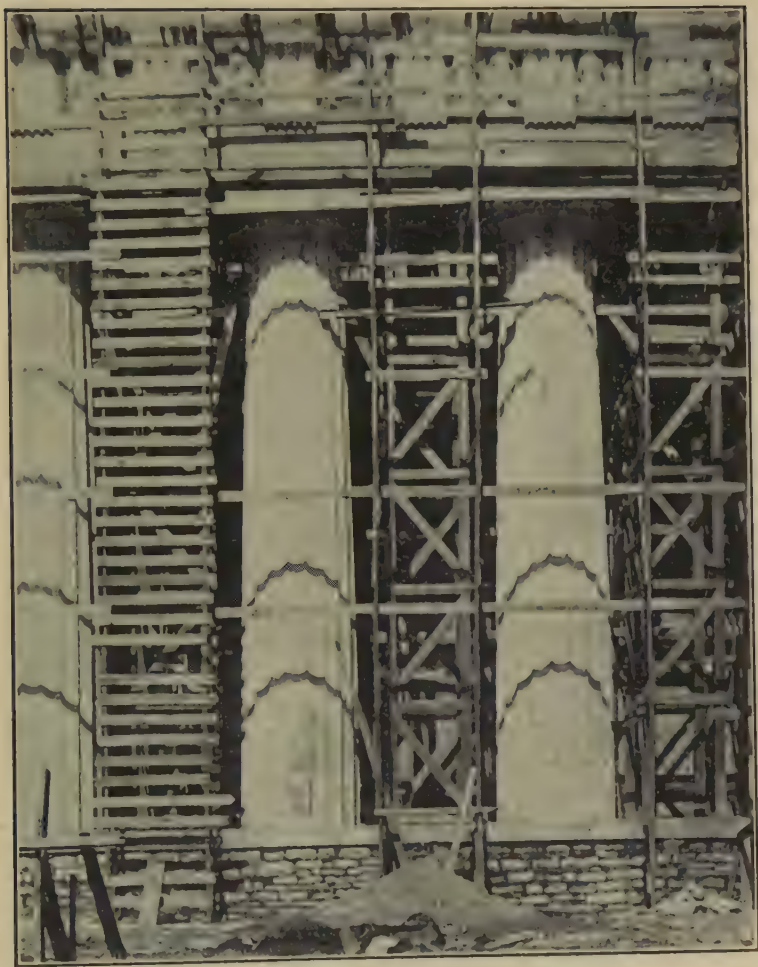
REBUILDING THE PARTHENON ENTABLATURE (NASHVILLE).
